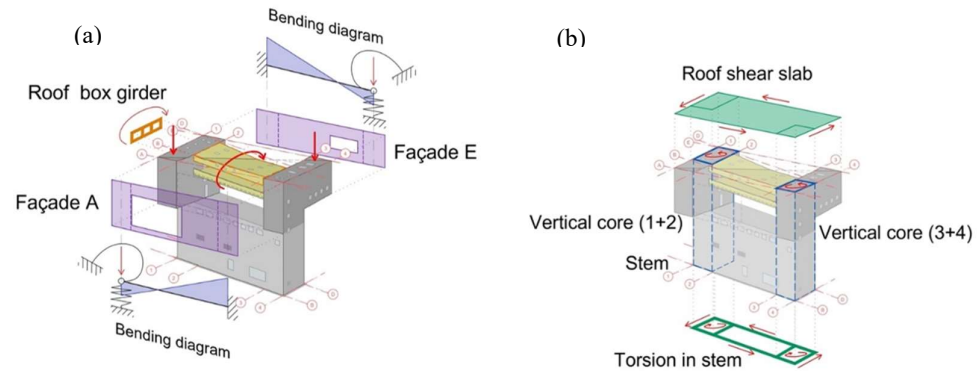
Façade bending diagram and roof box girder (a), roof shear slab diagram and torsion in the cores and stem (b).
